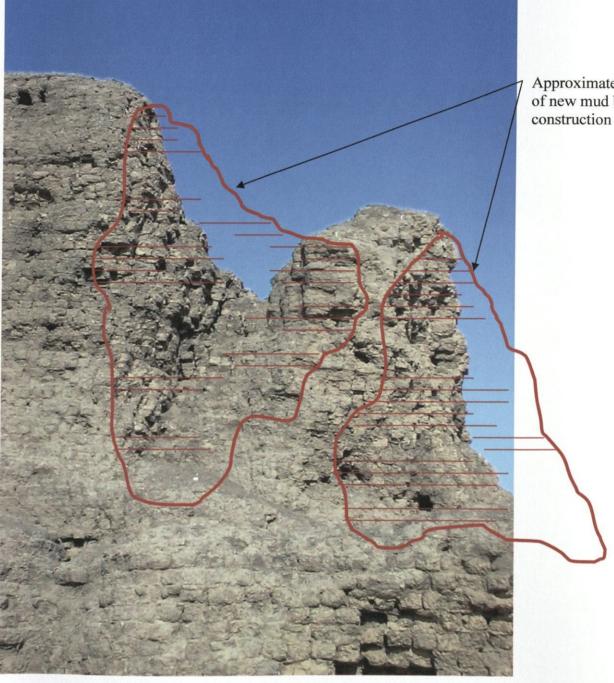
Detail of an area of missing wall mass at the southeast corner. The missing sections were reconstructed in 2005.
